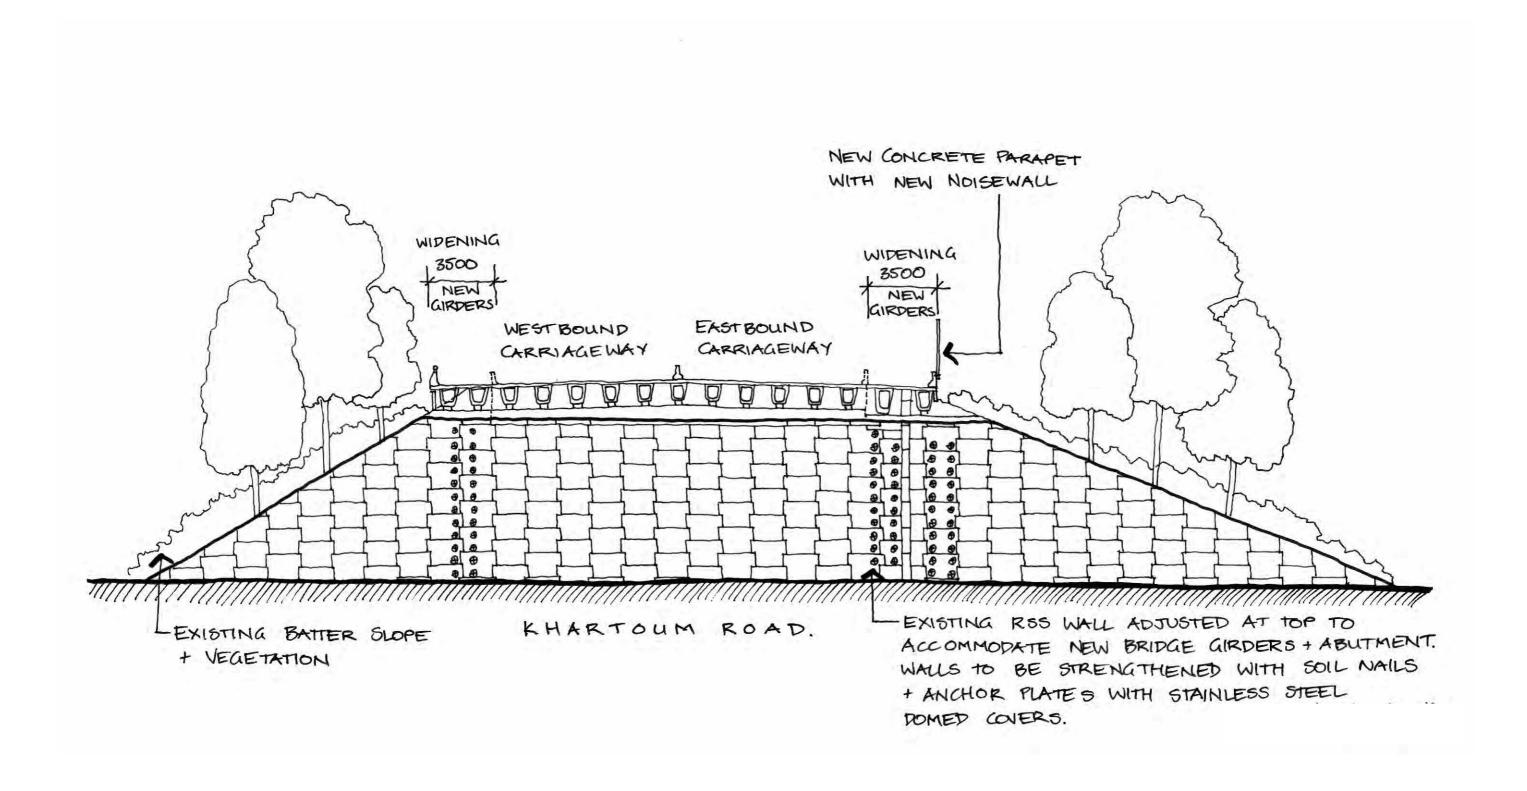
Bridge 6.1 Khartoum Road Bridge - Cross Section
